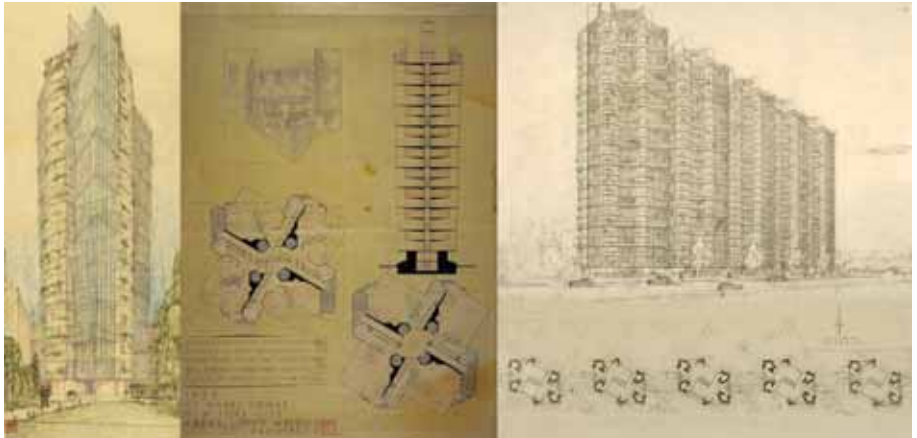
F.L.Wright: St. Mark's-in-the-Bouwerie Tower, New York Project 1927-31; Section and perspective cutaway of a duplex apartment with balcony and living-room floor plans, 1929; Grouped Towers, Chicago Project 1930 Perspective and plan . The Frank Lloyd Wright Foundation Archives (The Museum of Modern Art | Avery Architectural & Fine Arts Library, Columbia University, New York)
